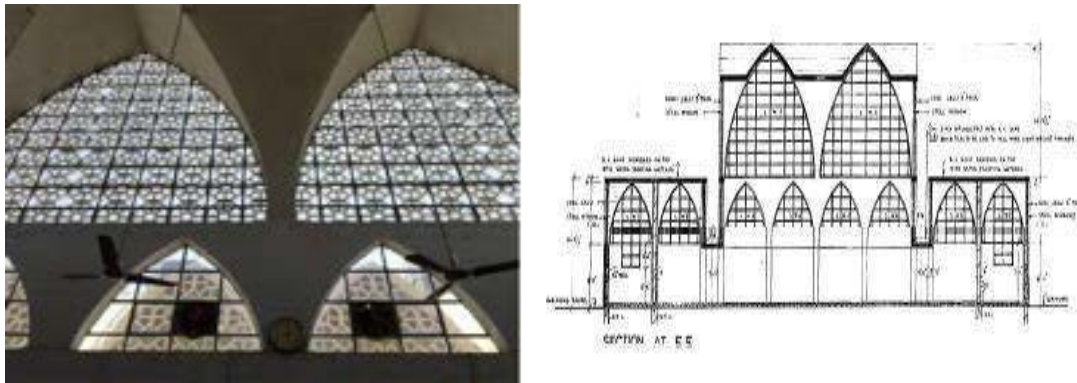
Markaz Ahlehadith – Elevation and Exterior
